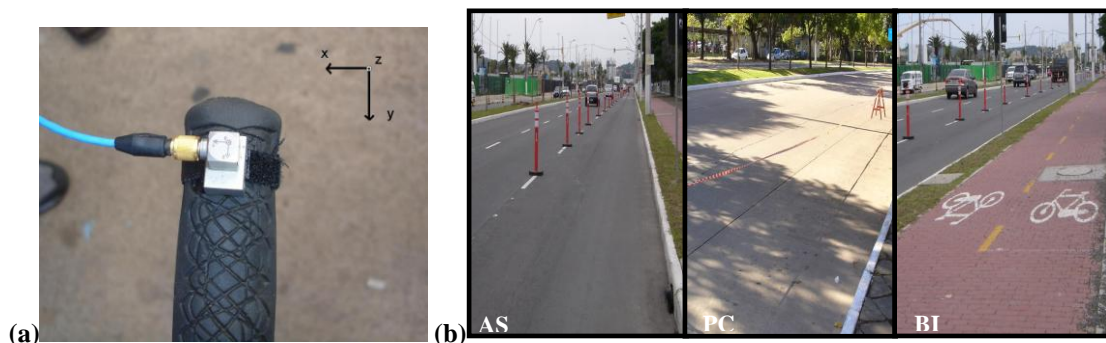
(a) Attachment of accelerometer on the bike's handlebar and the coordinate system adopted in the measurements. (b) Types of pavements used in measurements: Asphalt (AS), precast concrete slabs (PC) and interlocking concrete blocks (BI).
